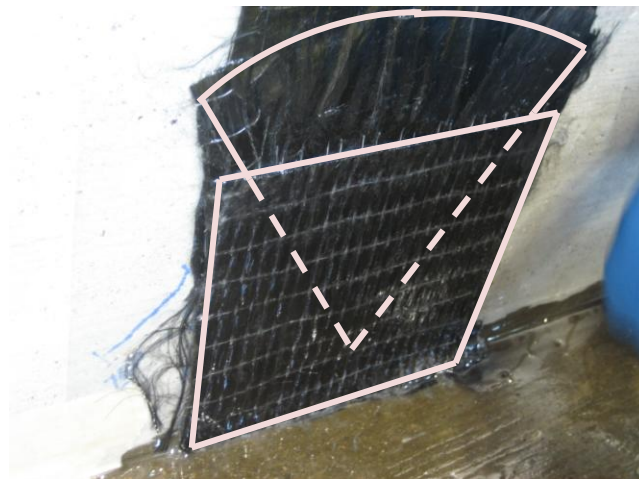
Completed CFRP anchor installation (Quinn, 2009)
